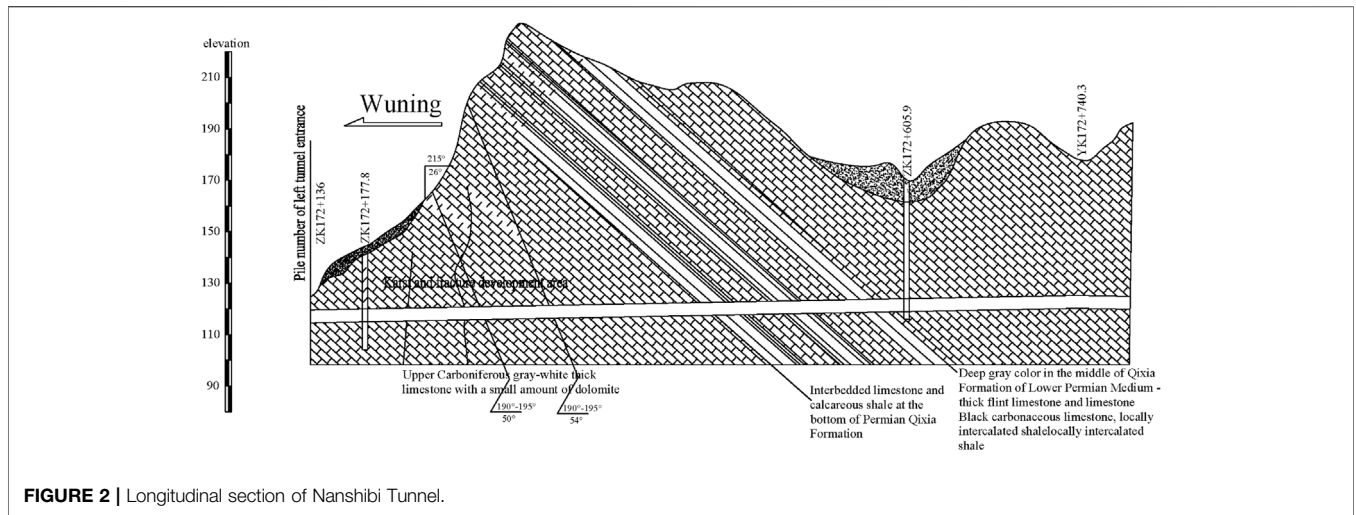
| Longitudinal section of Nanshibi Tunnel.
